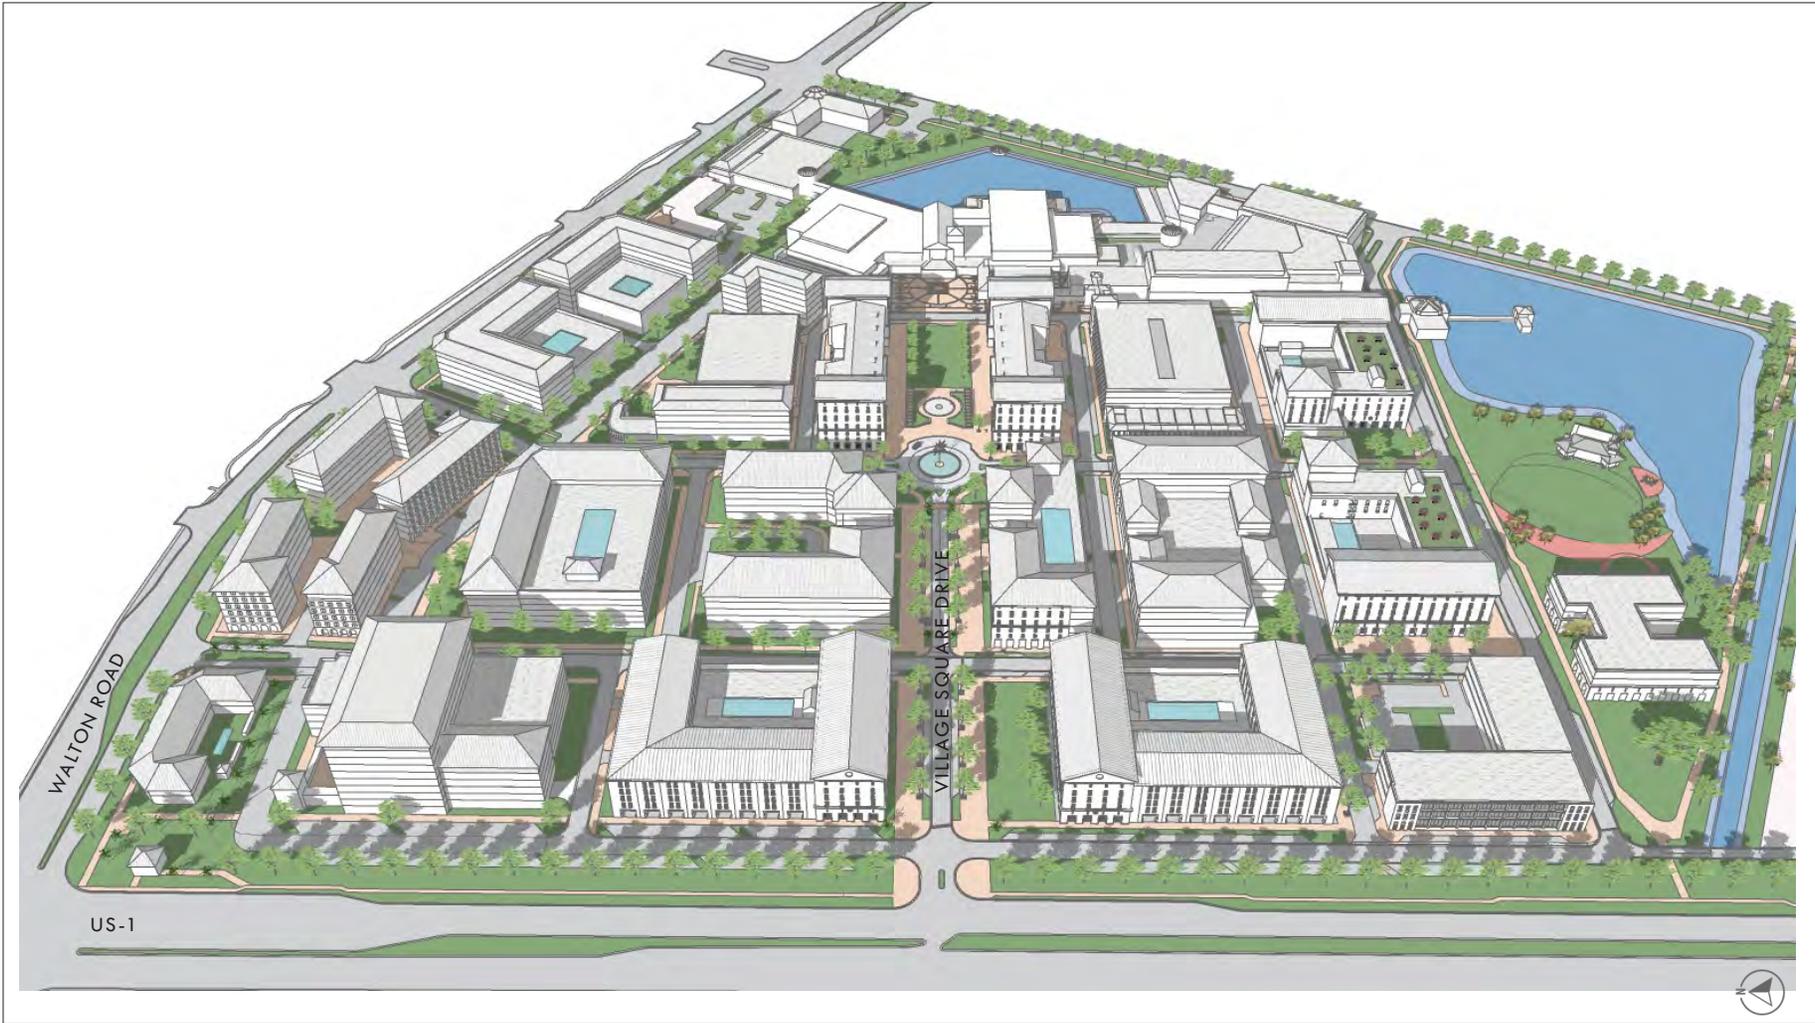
Overall Walton & One Master Plan Concept (looking east)
